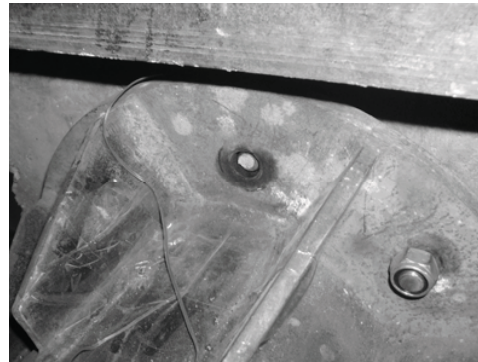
Bolt Fracture in Stiffened Sample
